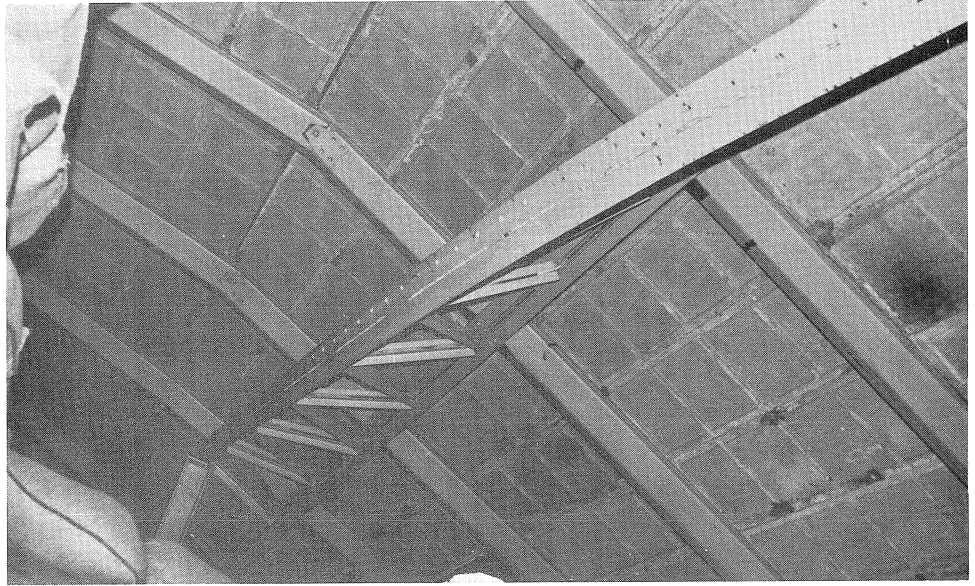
Failure of lattice girder in roof framework due to buckling.
